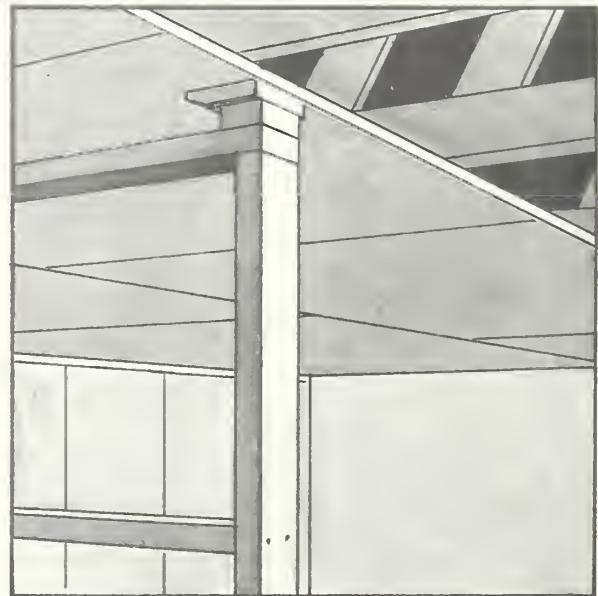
When curtain walls are too short, they are difficult to block and fasten into place.
